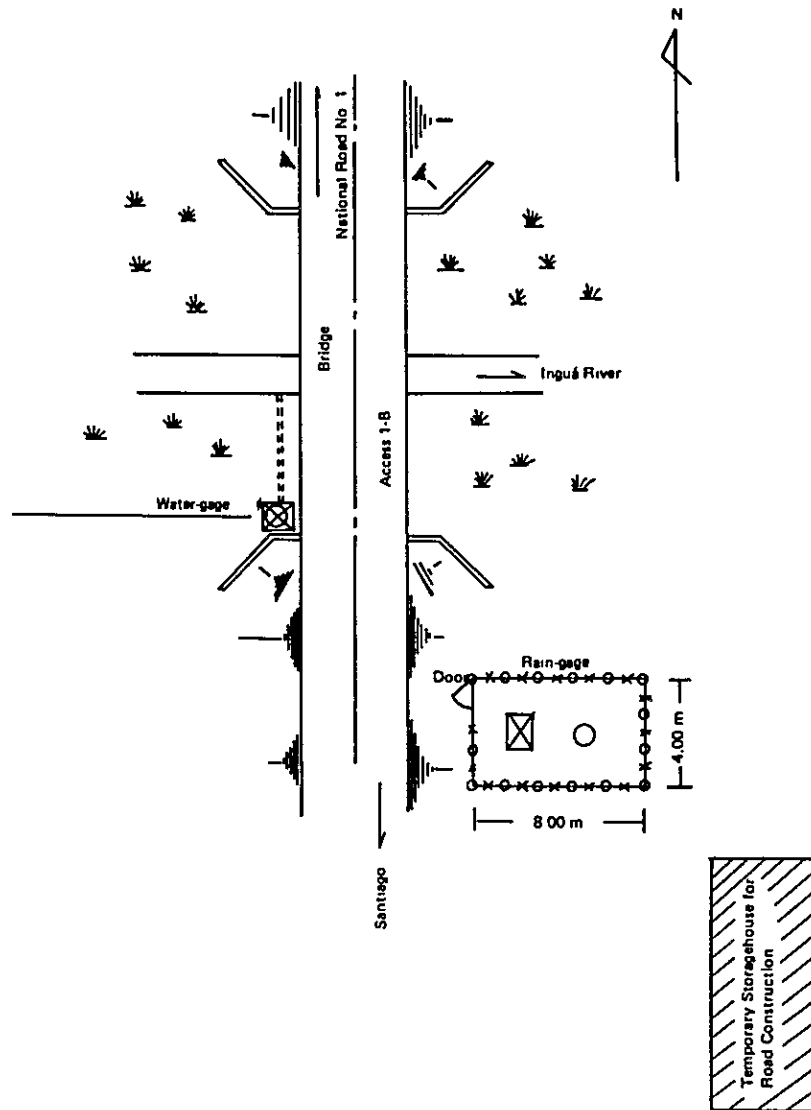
Location of Water Gage Installation at the Inguá River
